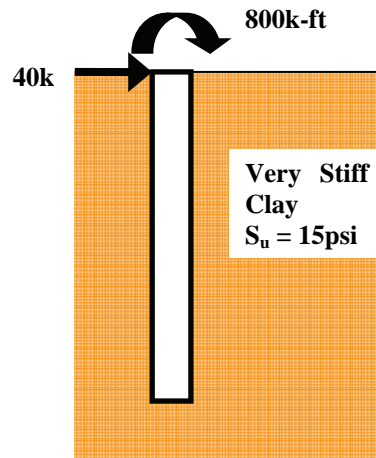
Simple Lateral Load Example, Factored Loads Shown
